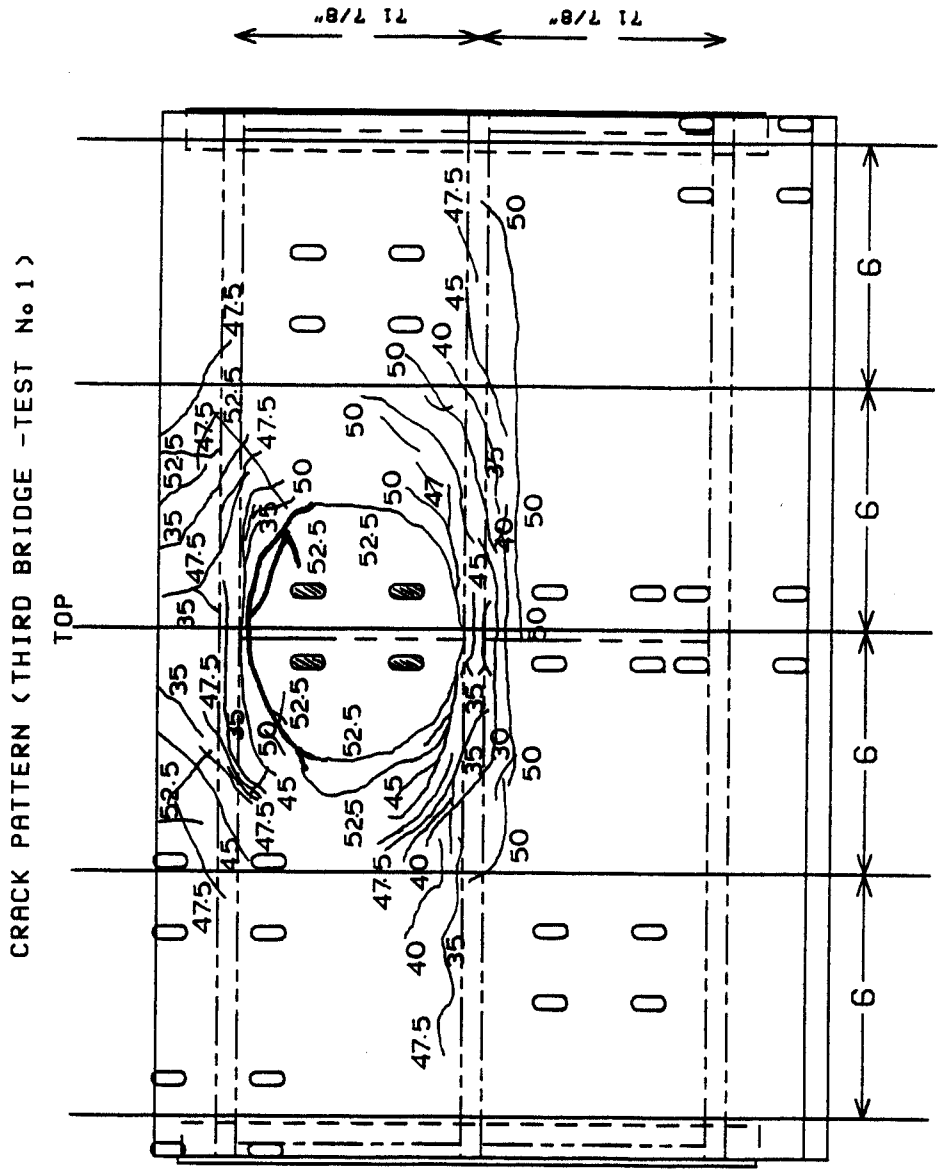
Top Cracking Pattern (Third Bridge - Test No. 1)
